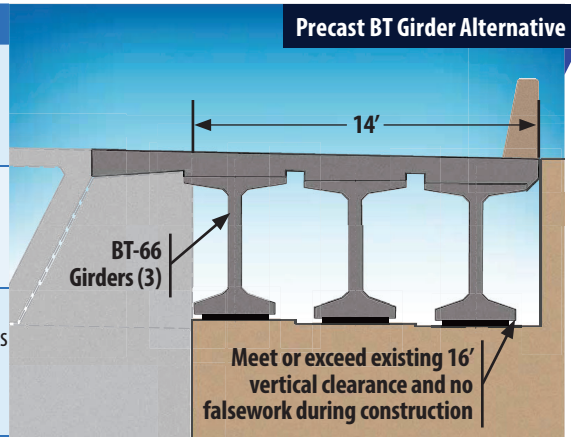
| Pros and Cons of Bridge Widening Alternatives
